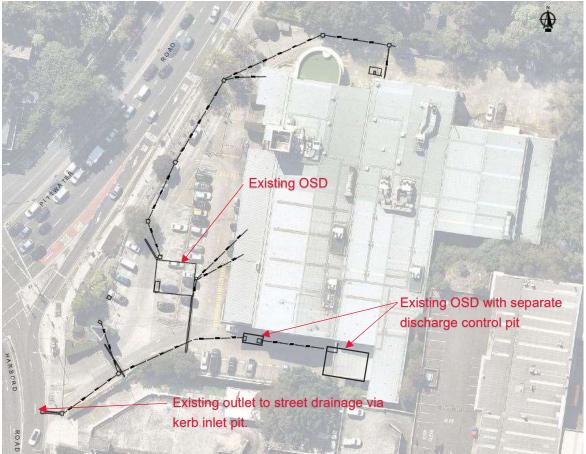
Pittwater Road Existing Stormwater Infrastructure
